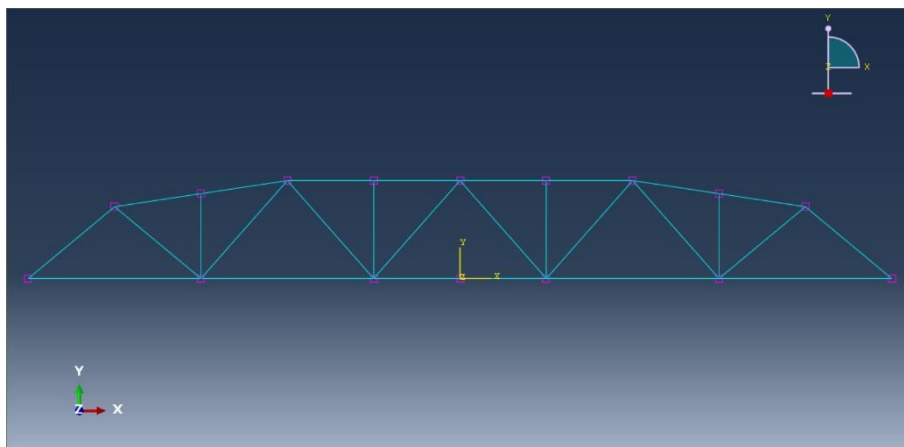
Finite element model of pony truss bridge (Photo credit: Original)
